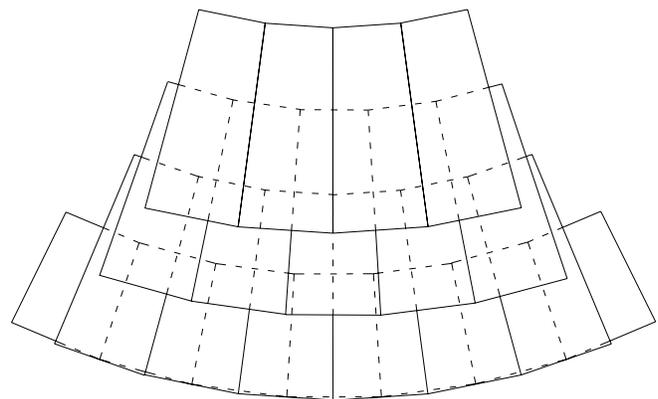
LAYOUT OF TURRET SHINGLES – TOP VIEW
